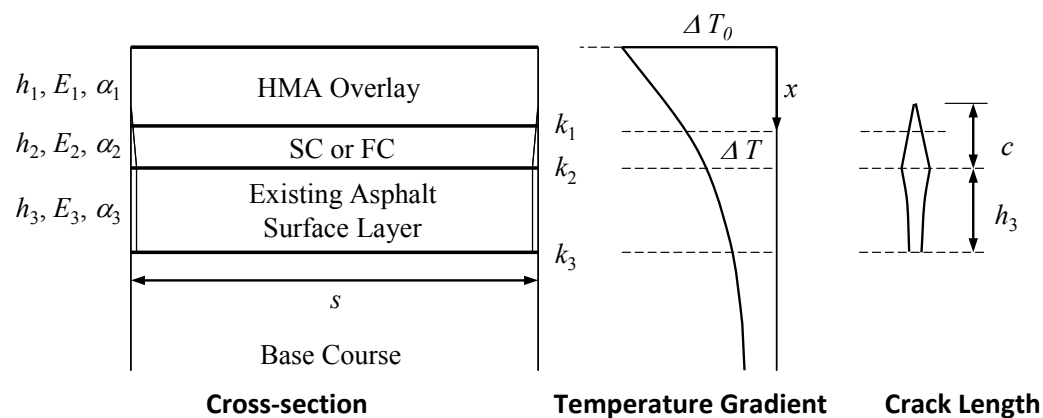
Diagram of HMA overlay on asphalt concrete pavement with SC or FC-thermal.
